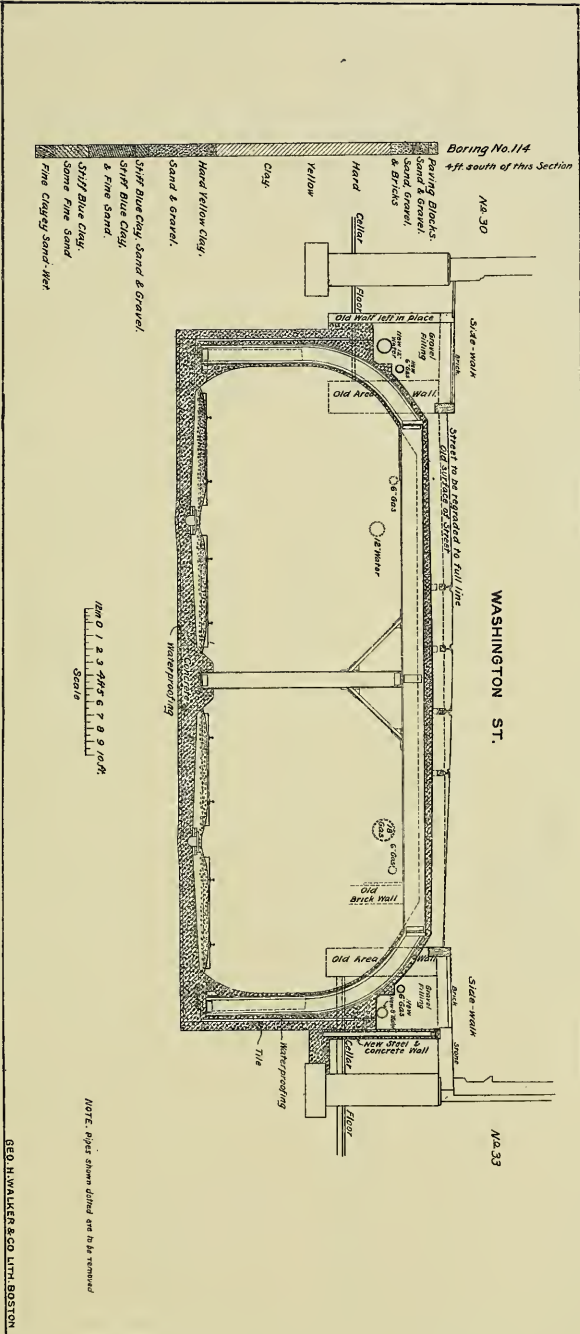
CROSS SECTION (LOOKING SOUTH) OF FOUR TRACK SUBWAY, SECTION 10, 210 FT. NORTH OF HANOVER STREET.
